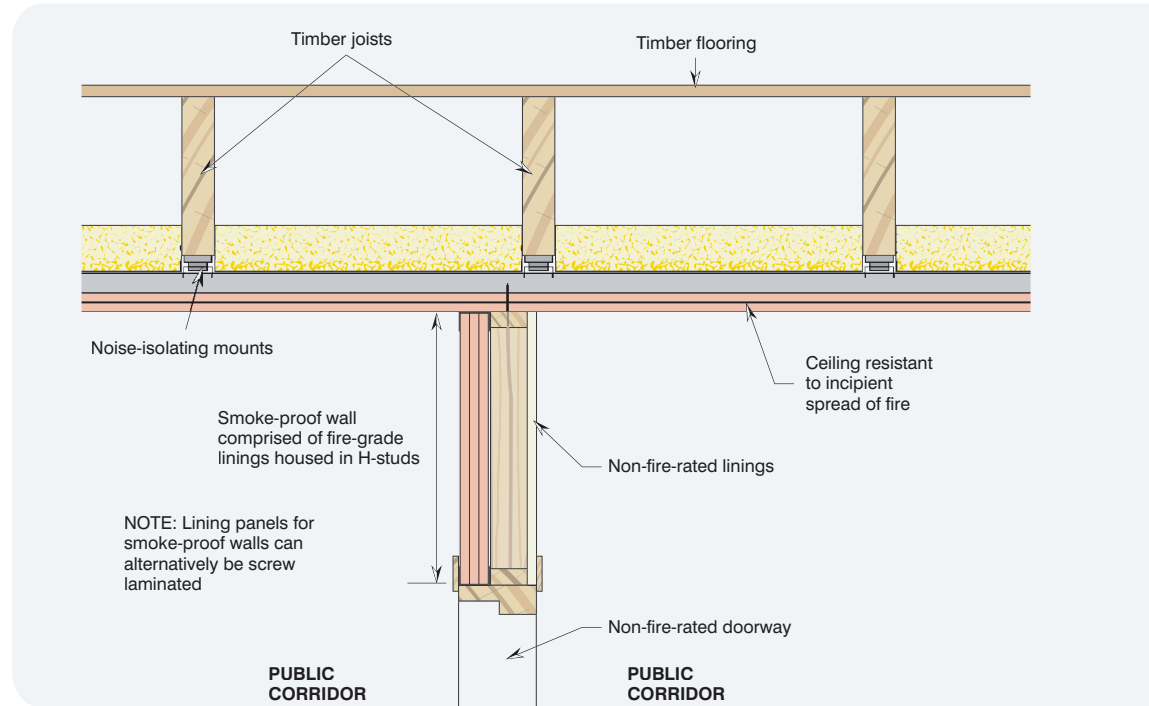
Laminated plasterboard smoke-proof wall – elevation view.
